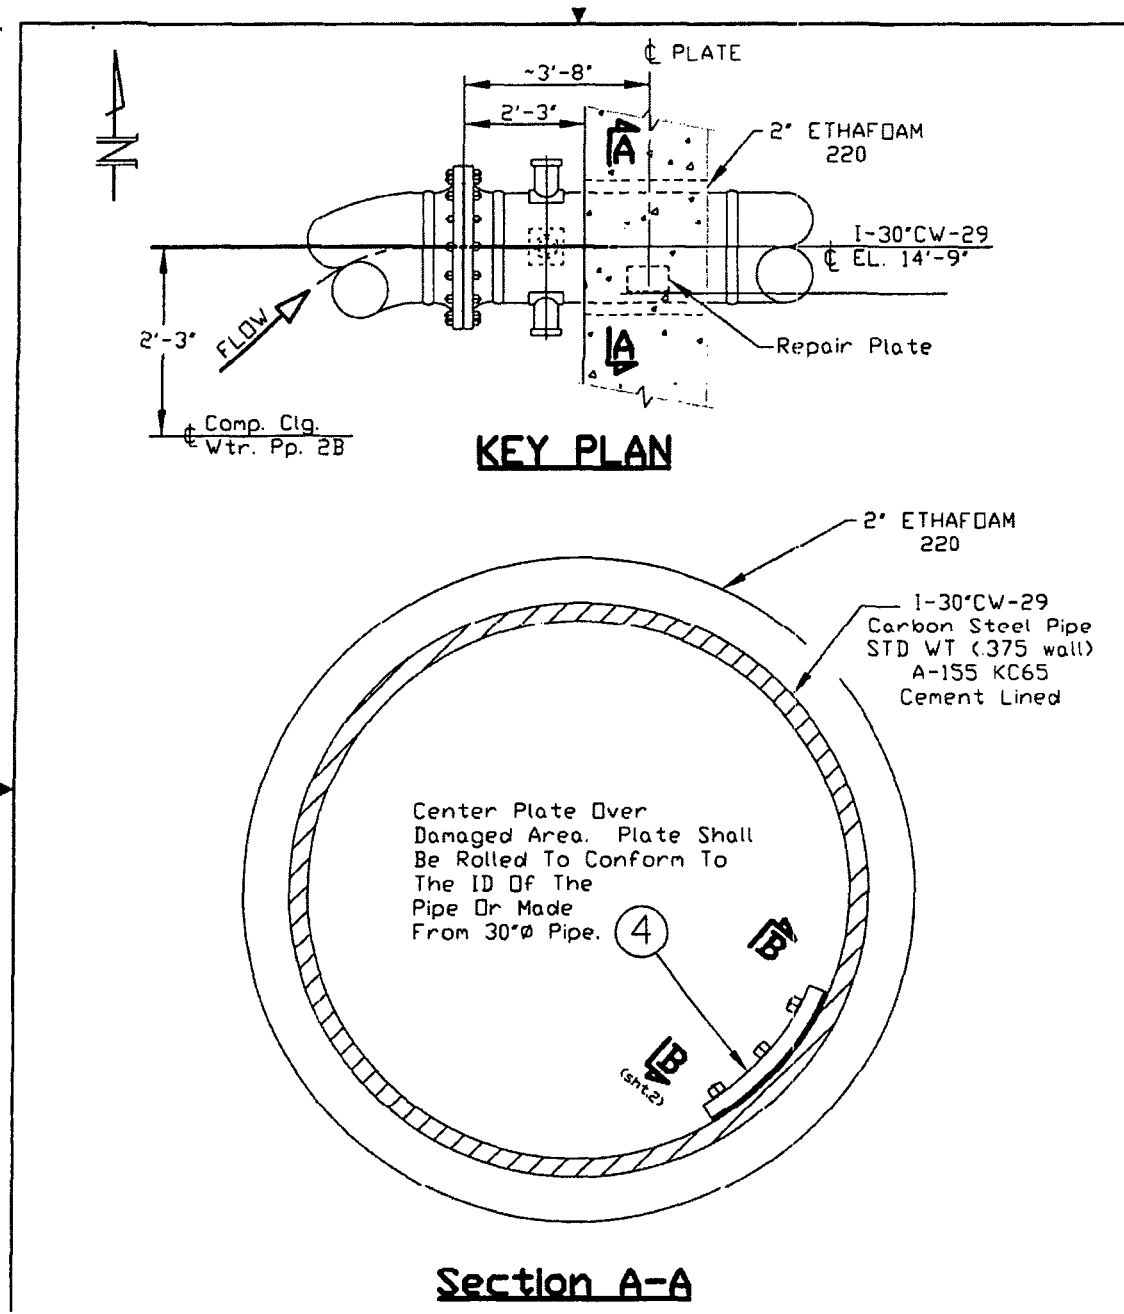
Typical Bolted Patch Plate Drawing Key Plan and Section A-A View
